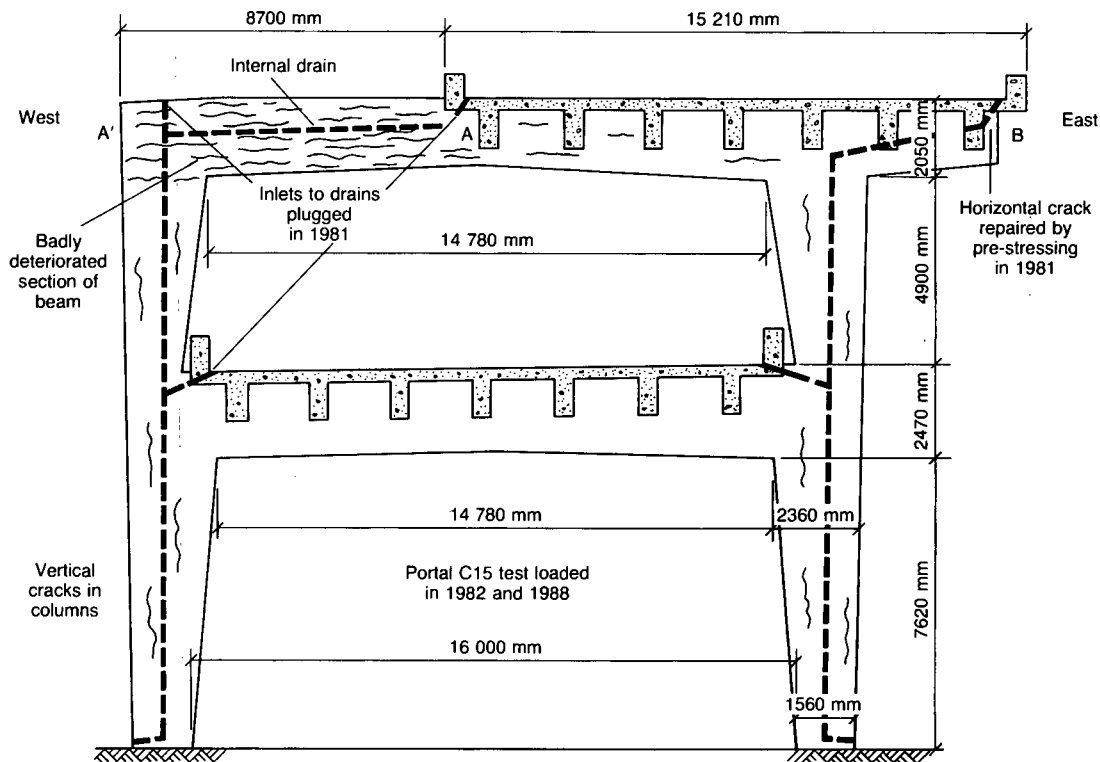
Elevation looking north of portal showing location of deteriorated concrete and internal drainage ducts
